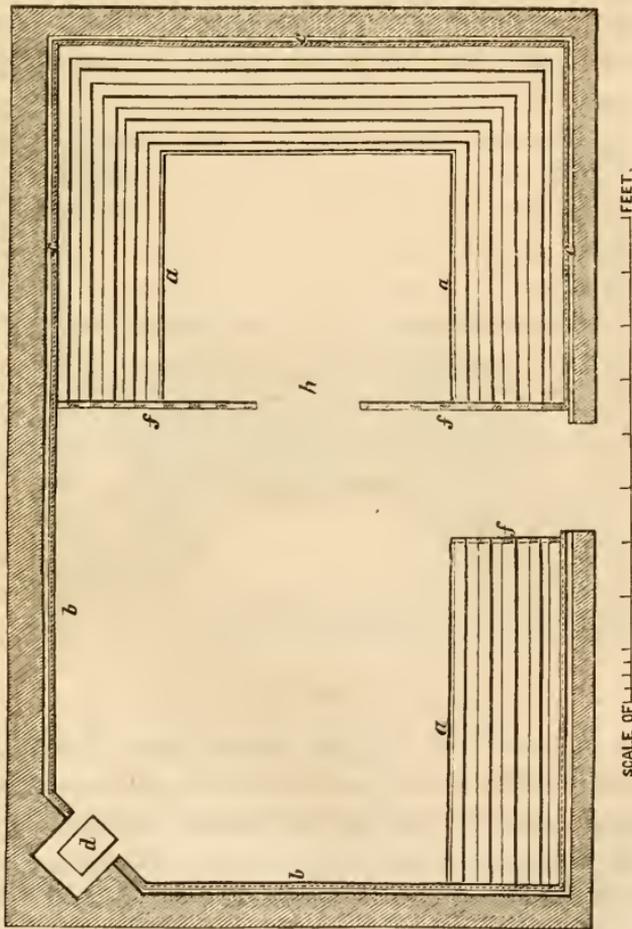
Plan of Mr. Moorman's Fruit Room.
